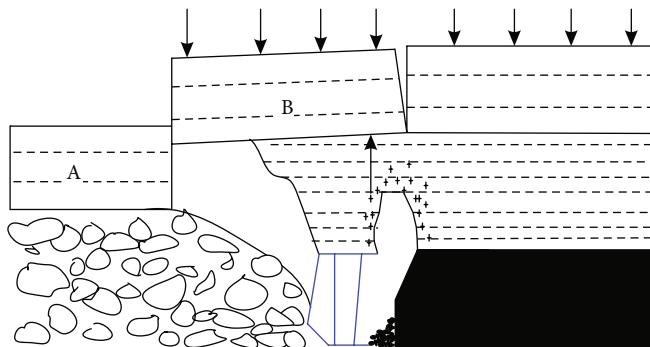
Roof caving caused by coal wall spalling.
